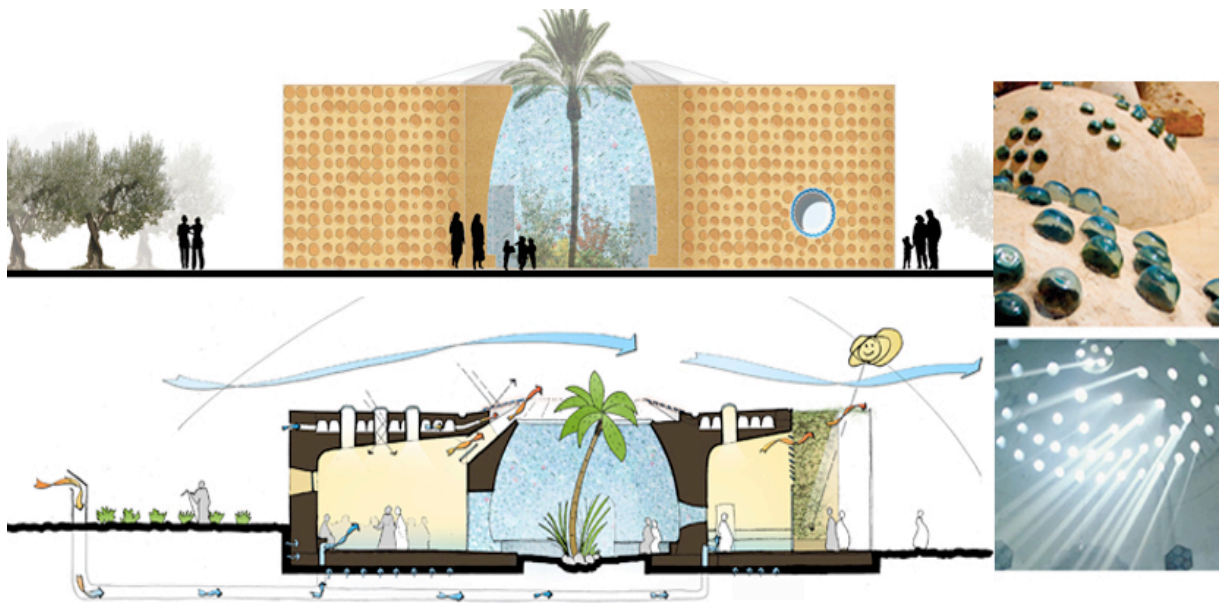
Concept for earthen building, Aqrabaniya Women Centre, Palestine
